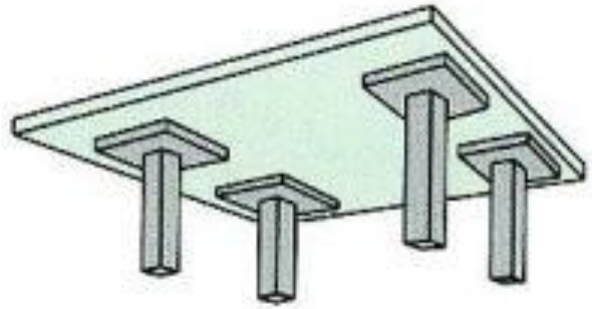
Flat Slab with Drop Panels (image provided by concrete.org.uk)
